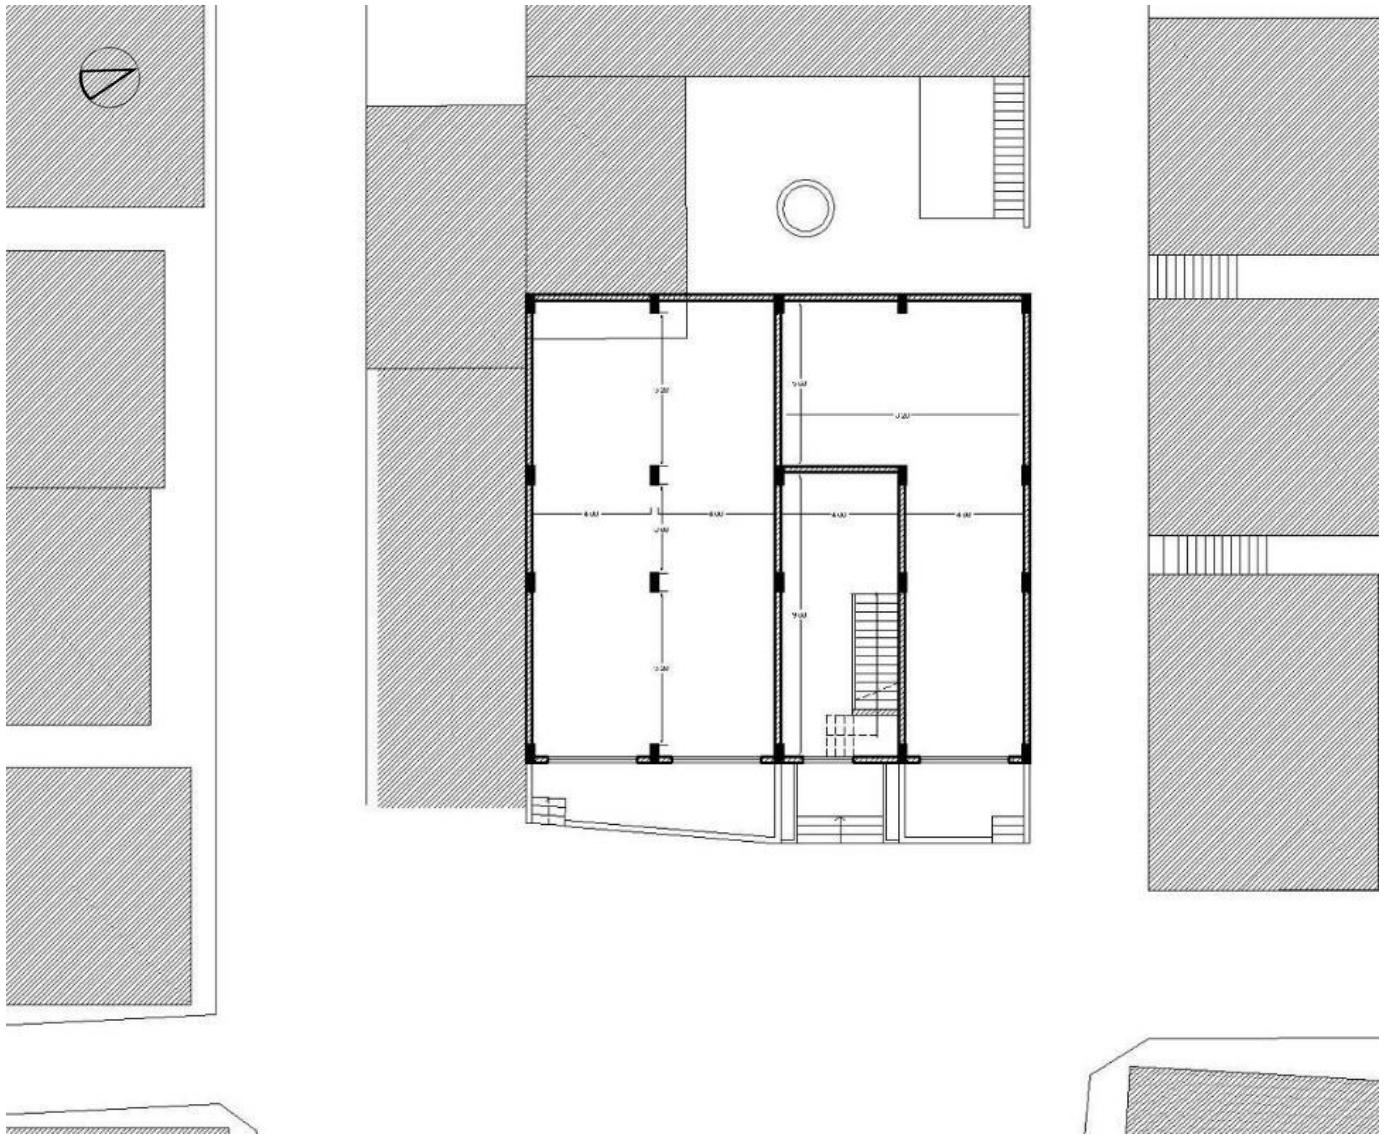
1st floor plan. To the eastern part is Mohammad's share, whereas to the western side, is Hosny's share of the building in the ground floor. (Source: Author (2019))
